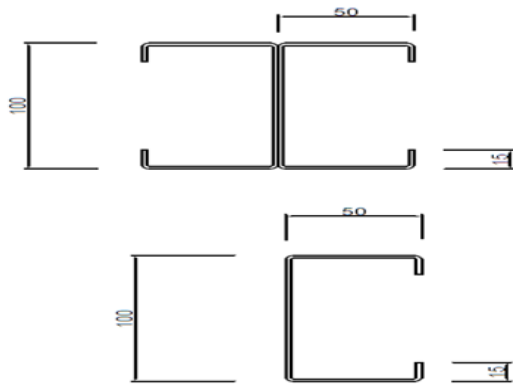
Section geometries- cold-formed steel built-up section C100X50X15 mm
